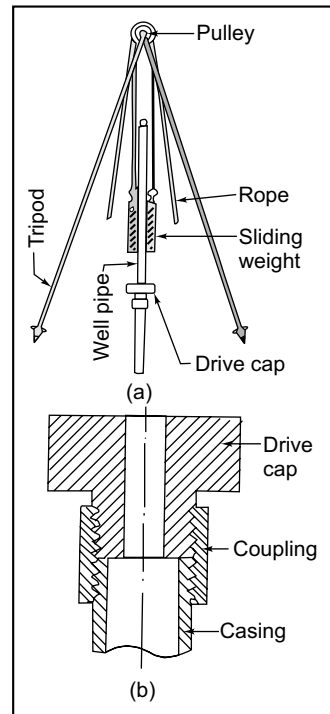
Drive monkey arrangement for driving shallow tube wells: (a) Tripod, pulley and weight, (b) Section through drive cap (Enlarged view)
